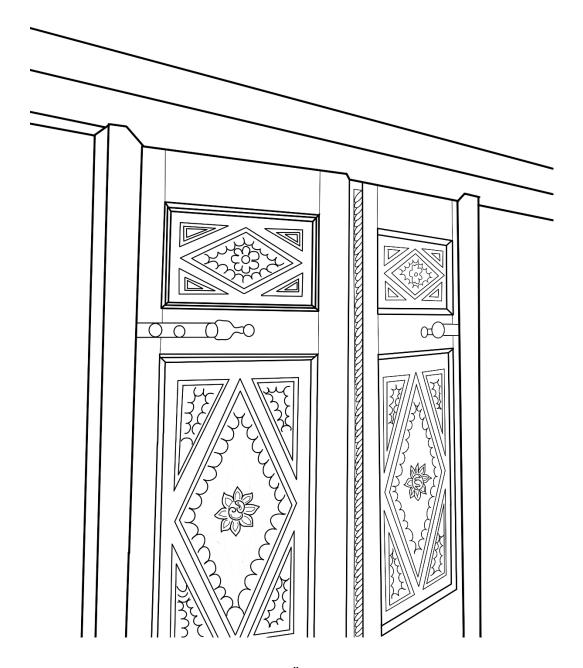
"Musandër" in wall sketch at Ëngjëll Çeka's house [24].
